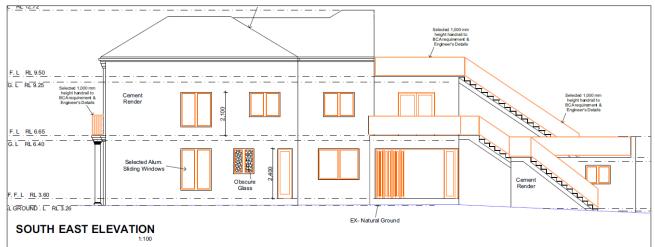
South east elevation showing staircase arrangement to the rear (Source: Benyana Building Design).
